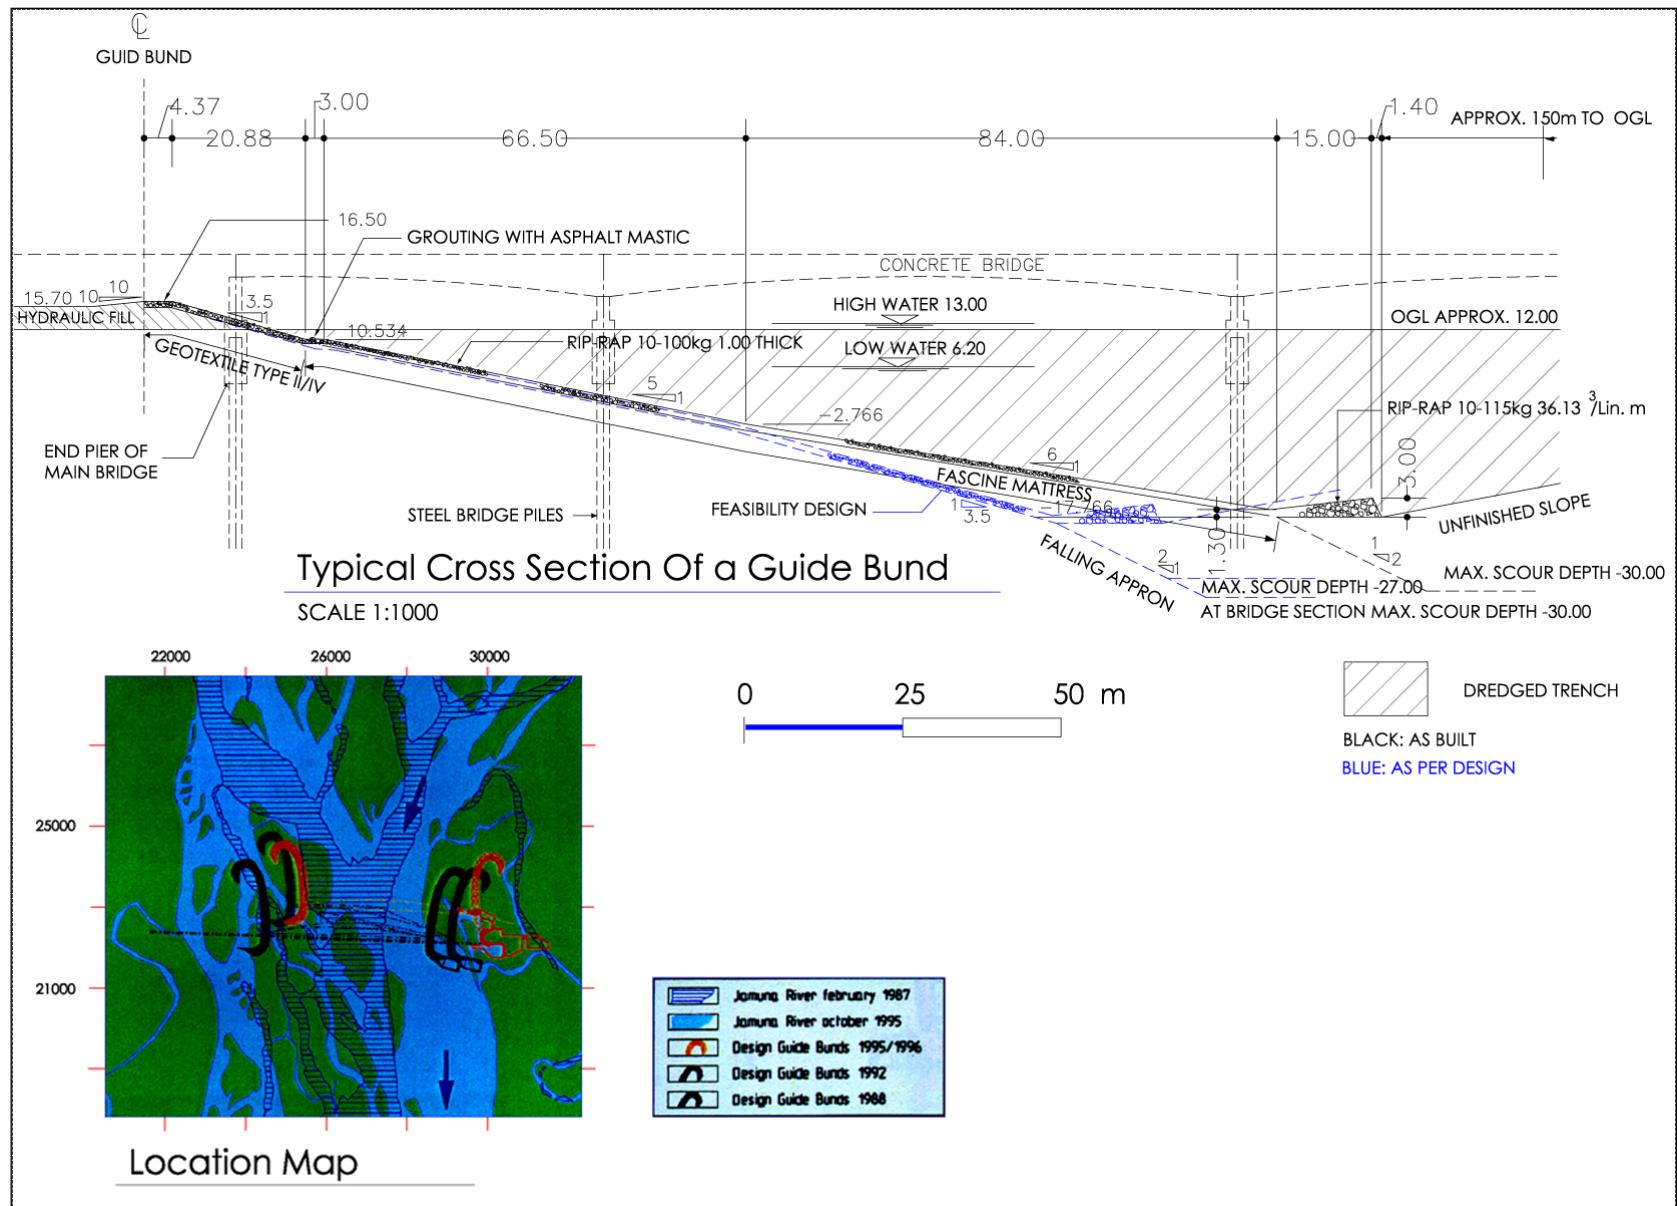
Typical cross-section of Jamuna Bridge guide bund.
